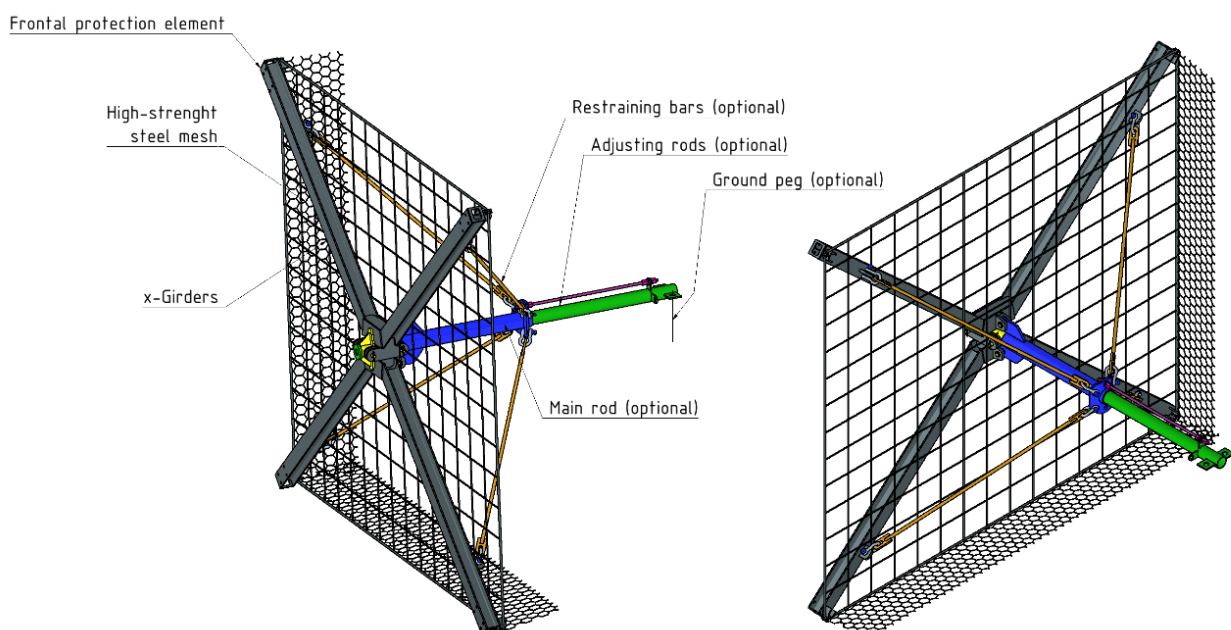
High load-bearing earth retaining structures of quadratic shape for slope stabilisation
